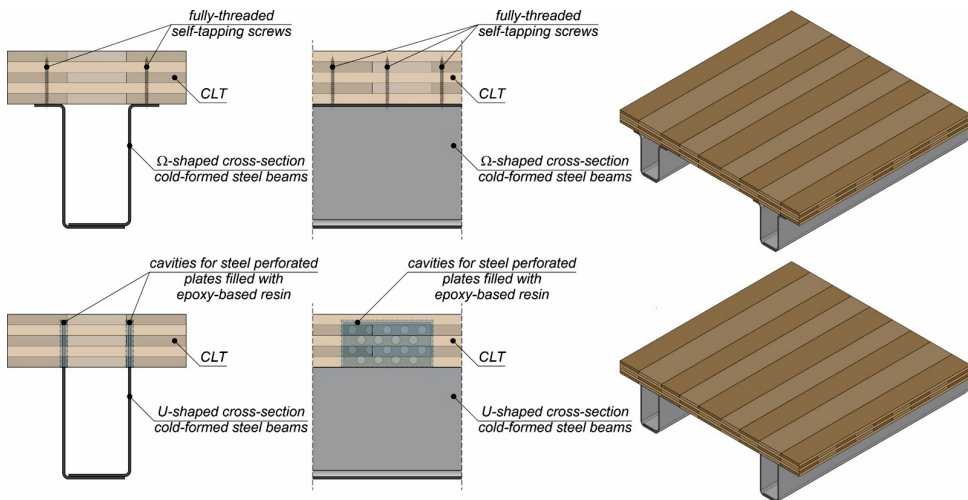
Steel-timber composite beams with omega-shaped and U-shaped cross-section girders developed by Loss and Davison [23]
